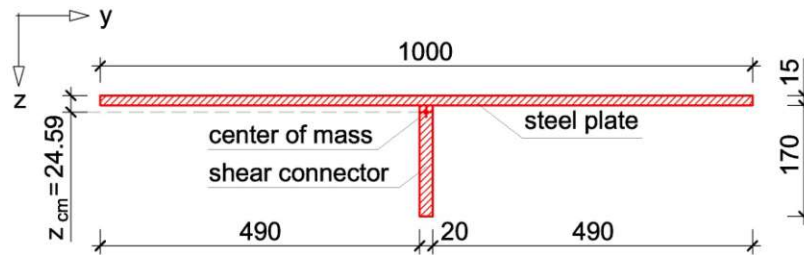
The cross section of the top steel section of the SCSC plate. Dimensions in [mm]
